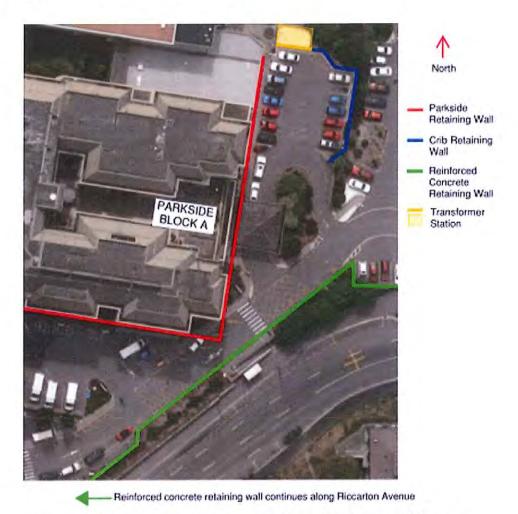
Retaining Walls around Christchurch Hospital Campus
